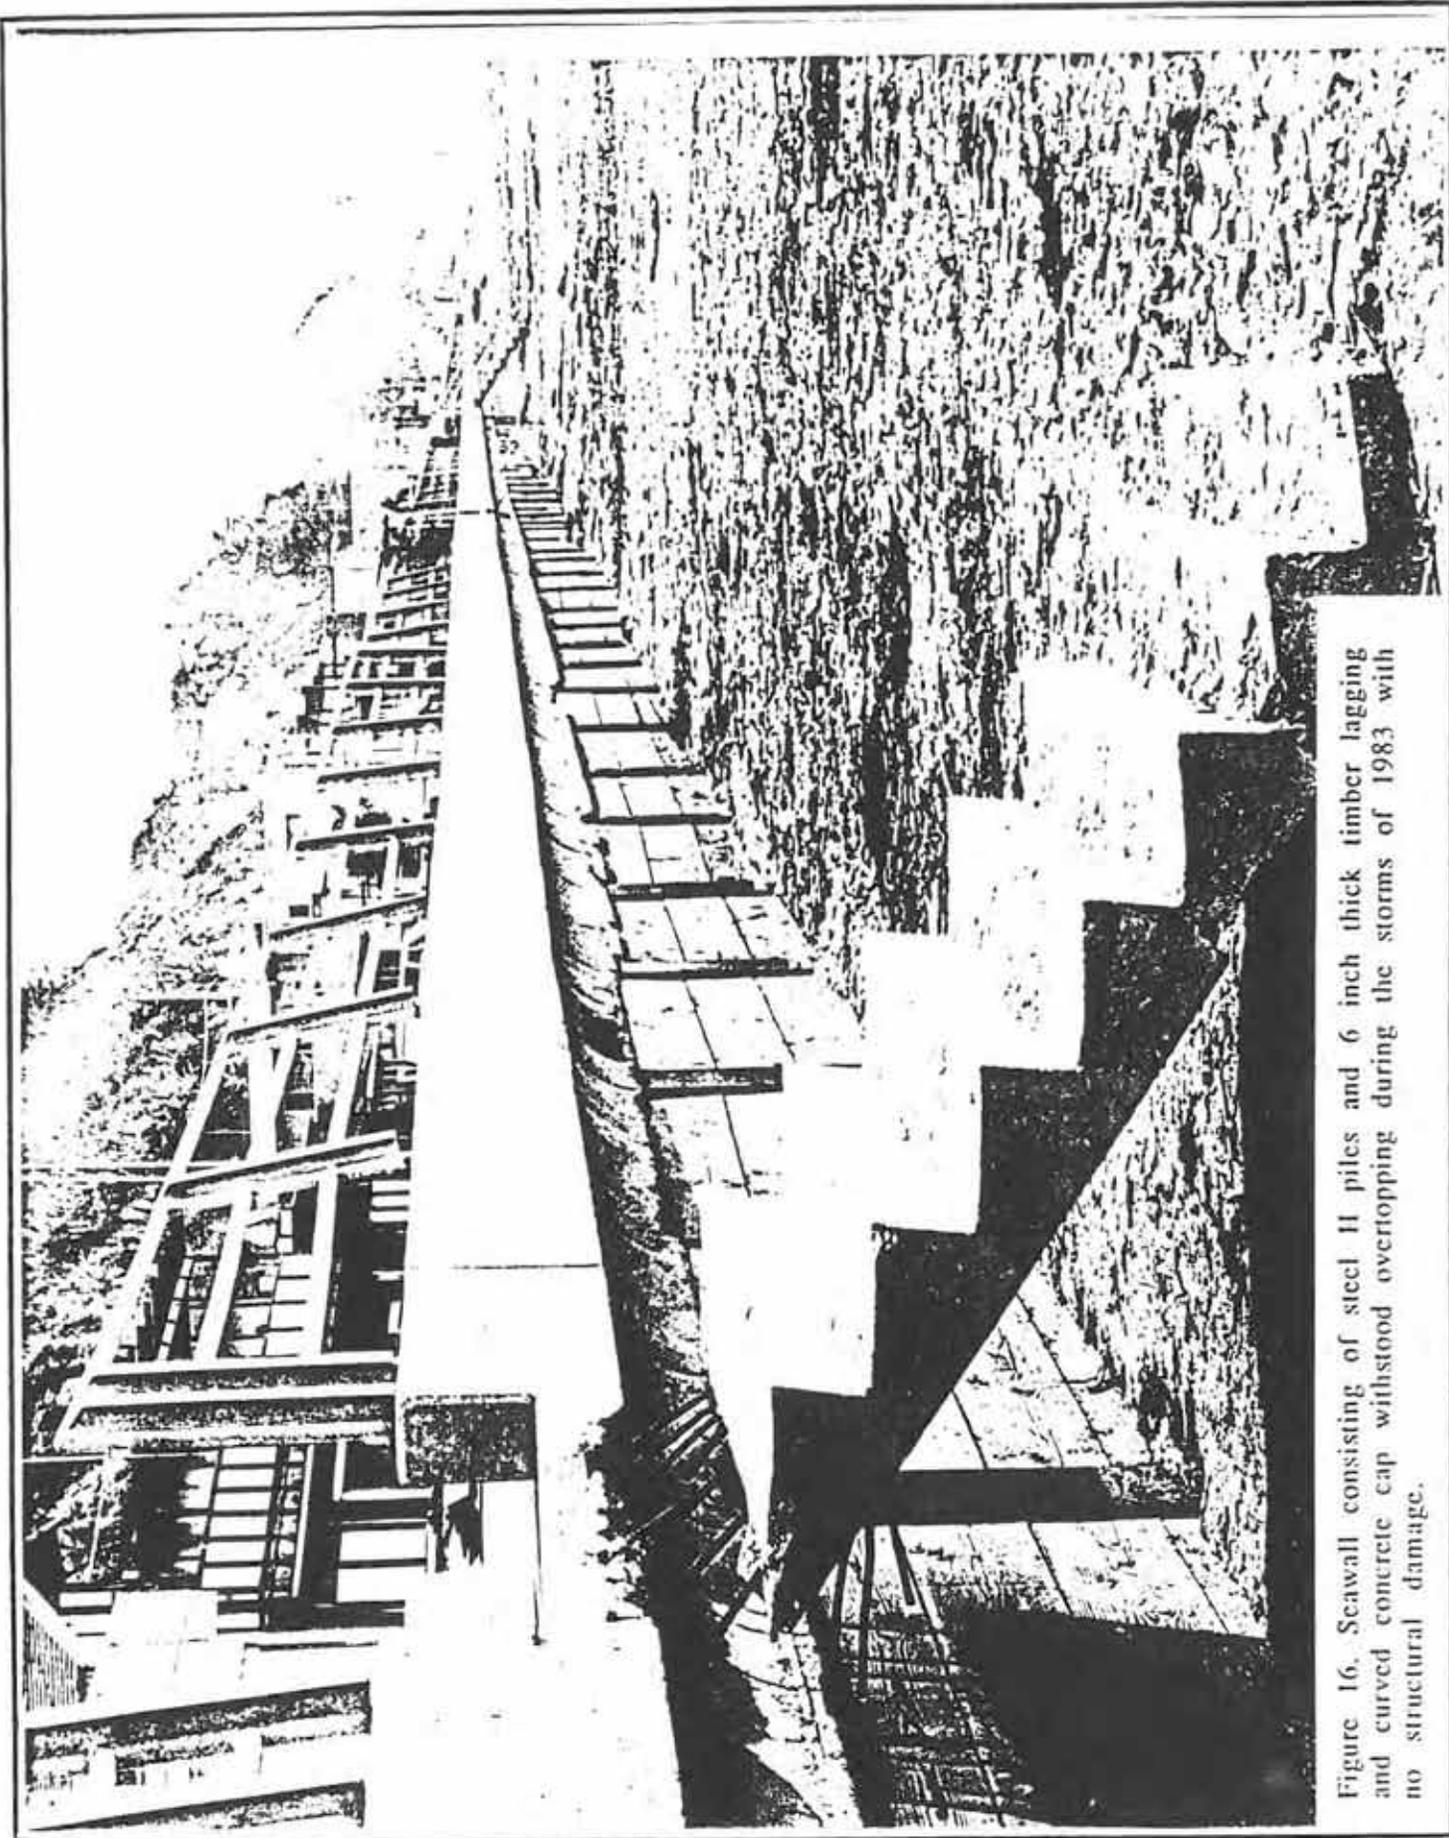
Seawall consisting of steel H piles and 6 inch thick timber lagging and curved concrete cap withstood overtopping during the storms of 1983 with no structural damage.
